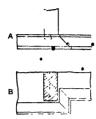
Elevation and Plan of Chimney-piece Cupboard Side.
